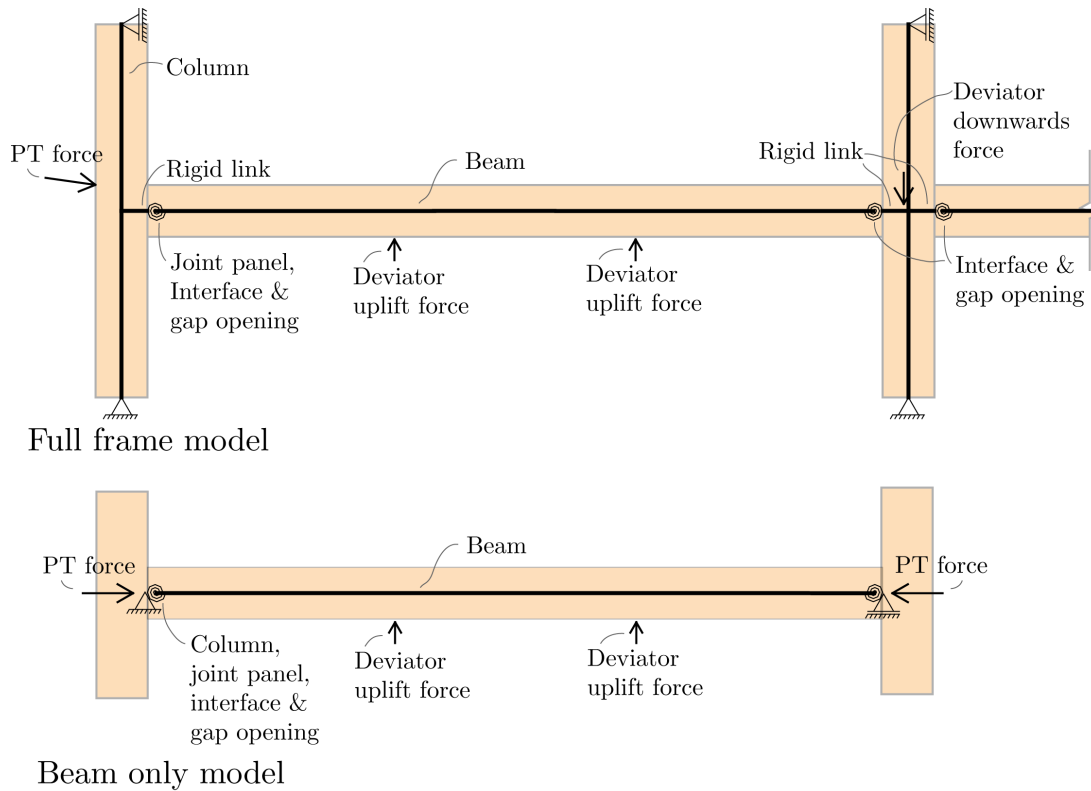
Schematics of modelling approach for full frame and beam only models
